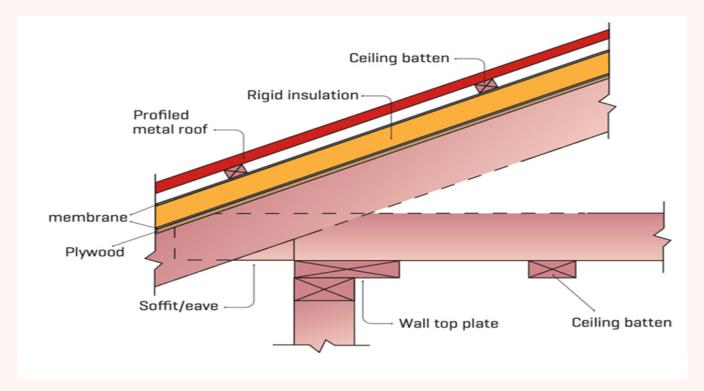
A schematic drawing of a warm roof as retrofitted to a house on the BRANZ campus.
